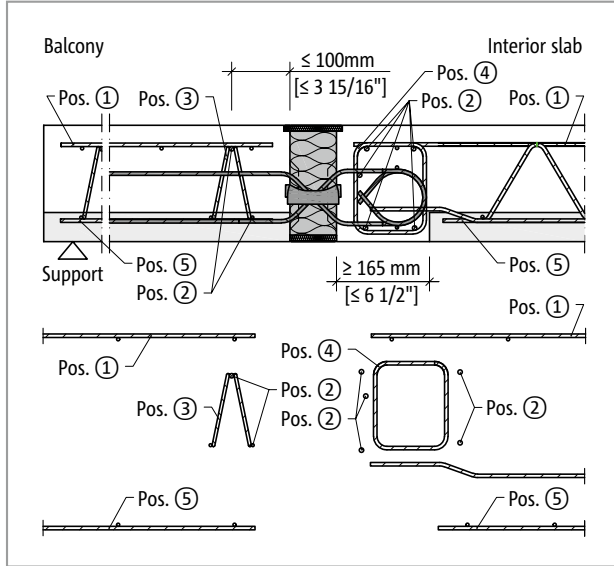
Schöck Isokorb® T Type CQ-VV1 to CQ-VV5: On-site reinforcement with lattice beam
